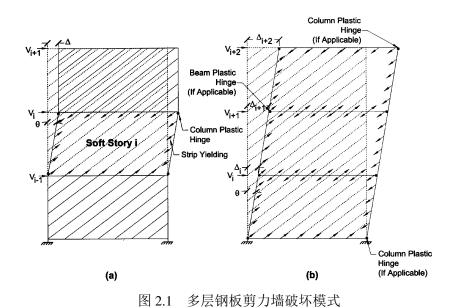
Collapse mechanisms for multistory steel plate shear walls
